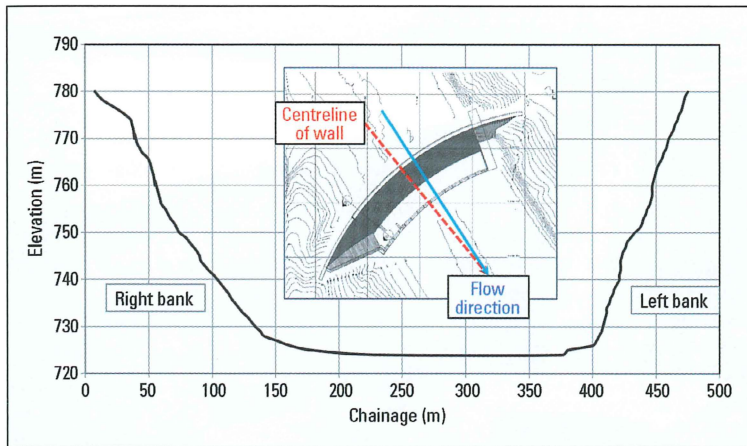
The asymmetrical cross-section of Neckartal dam (upstream view). (Inset: a plan view of final structural design reflecting the curvature of the dam wall and the flow orientation to the river).
